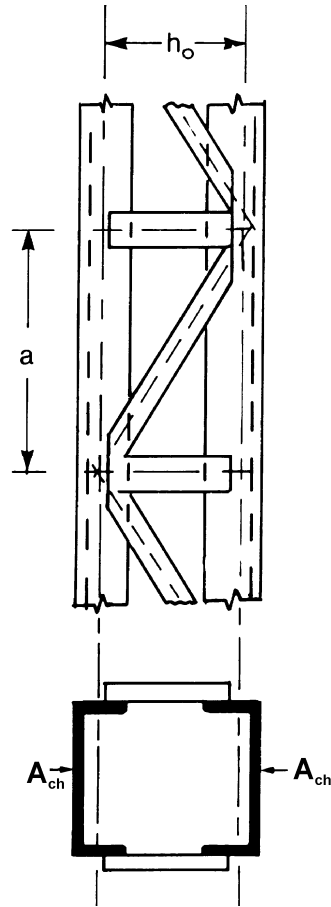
Part of a typical laced column and its built-up cross-section [2-24]
